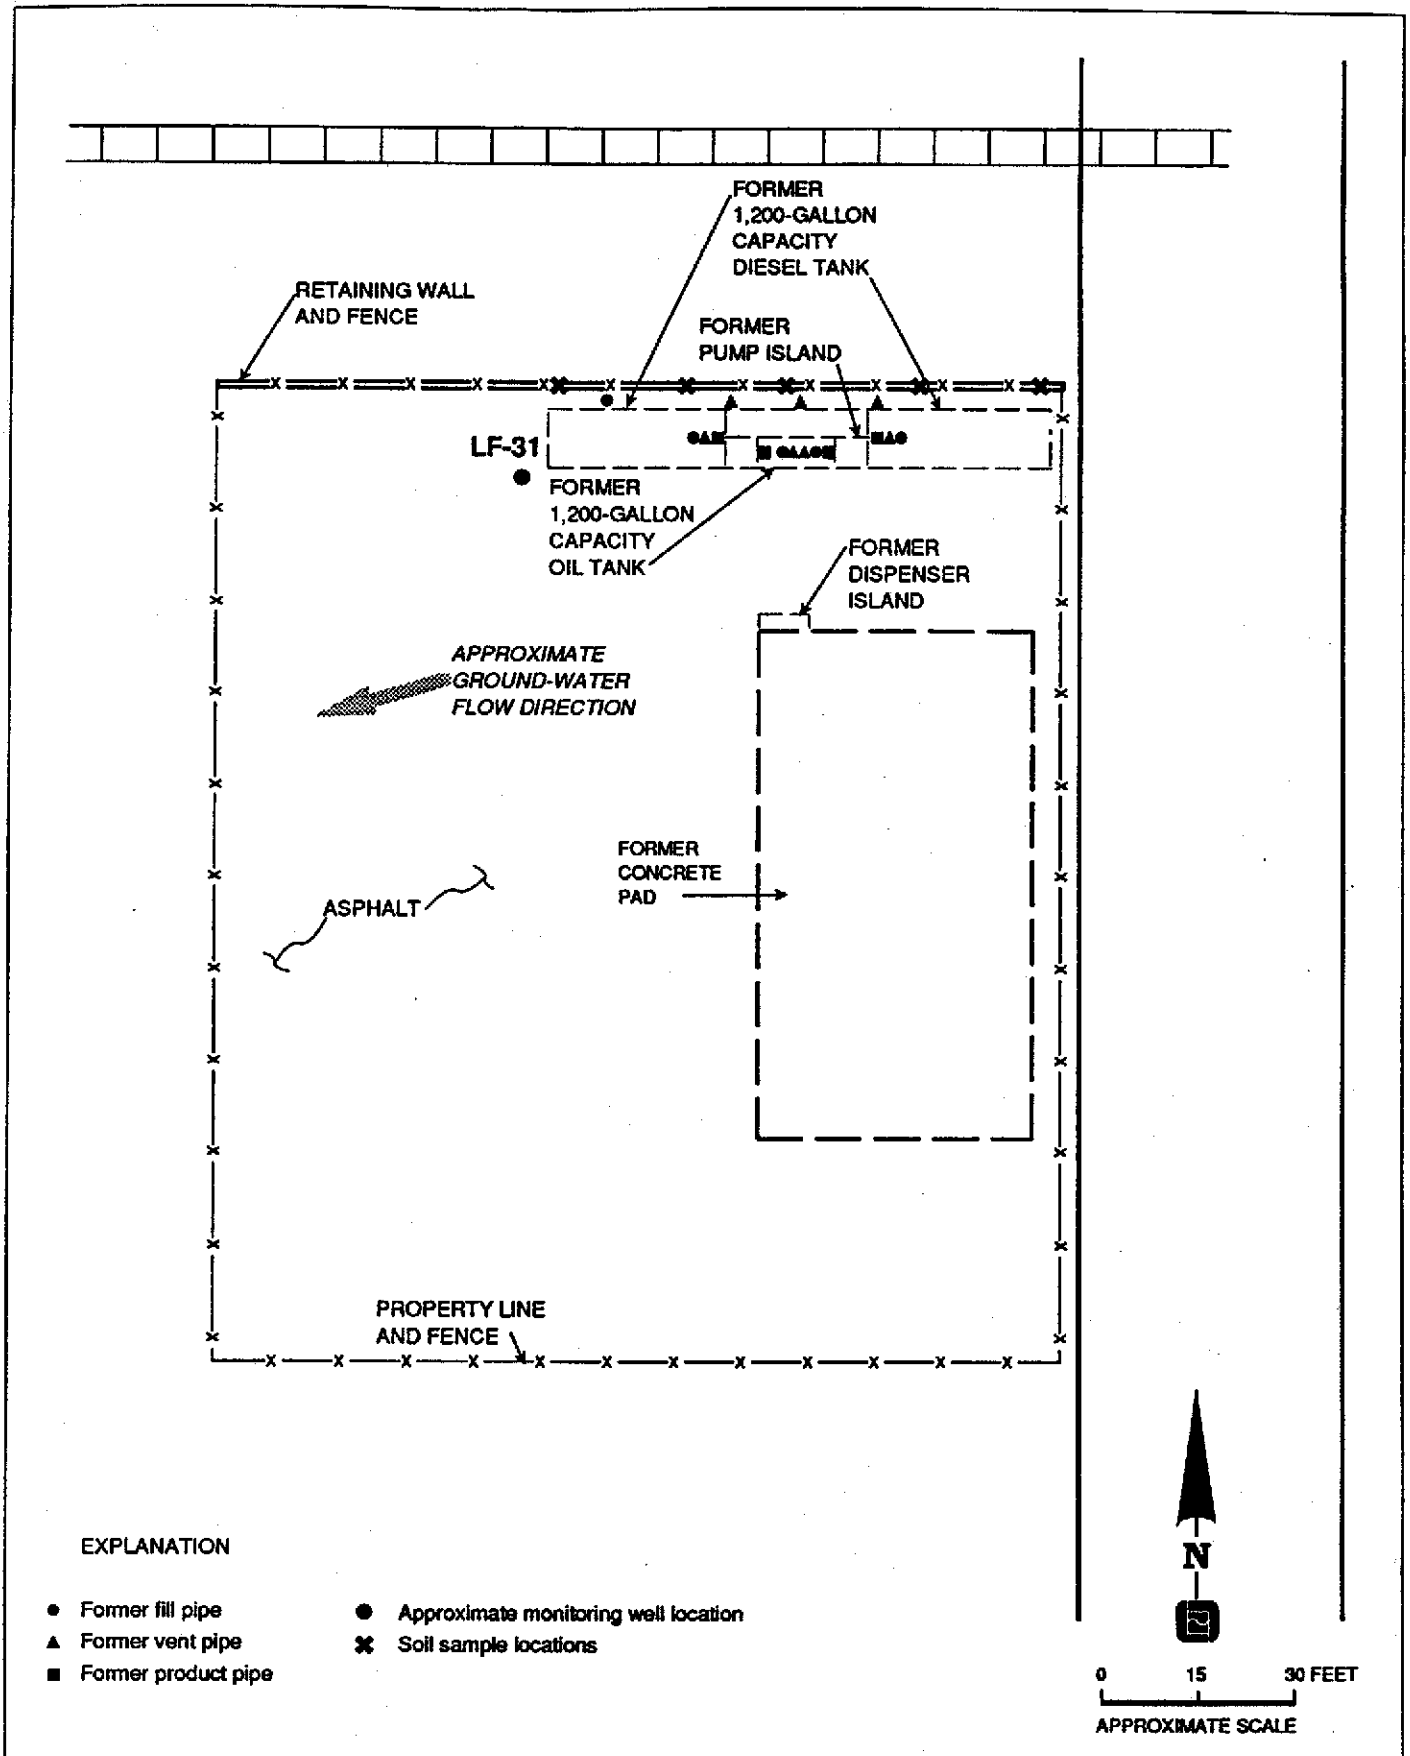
SITE PLAN SHOWING MONITORING WELL LF-31 AND SOIL SAMPLE LOCATIONS
